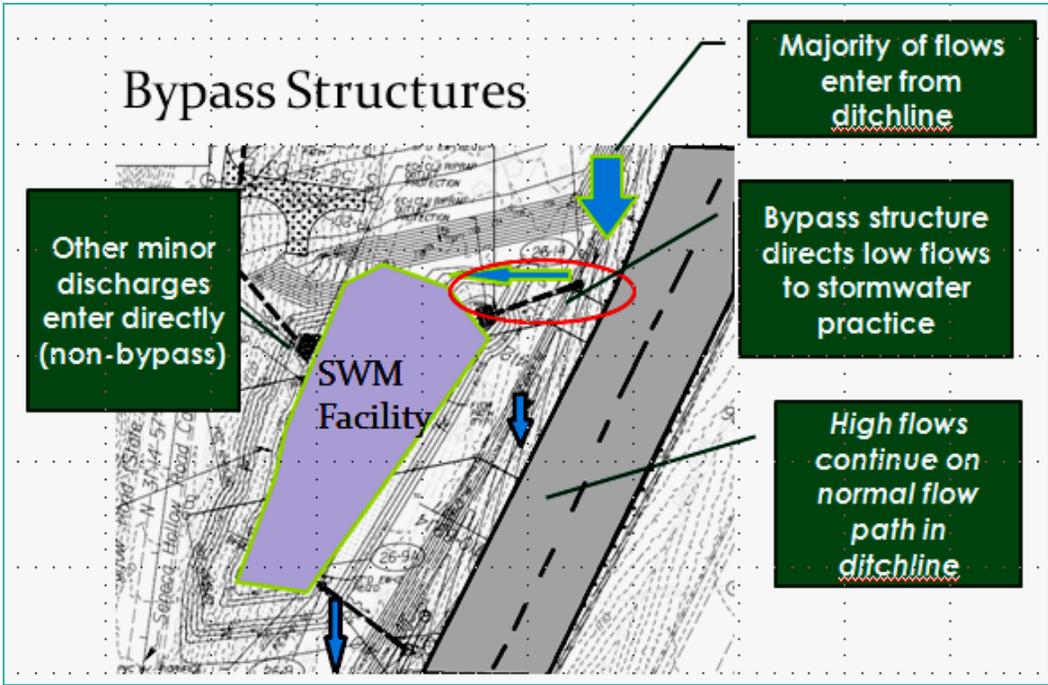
1 Simple Off-Line BMP Plan and Cross-section
